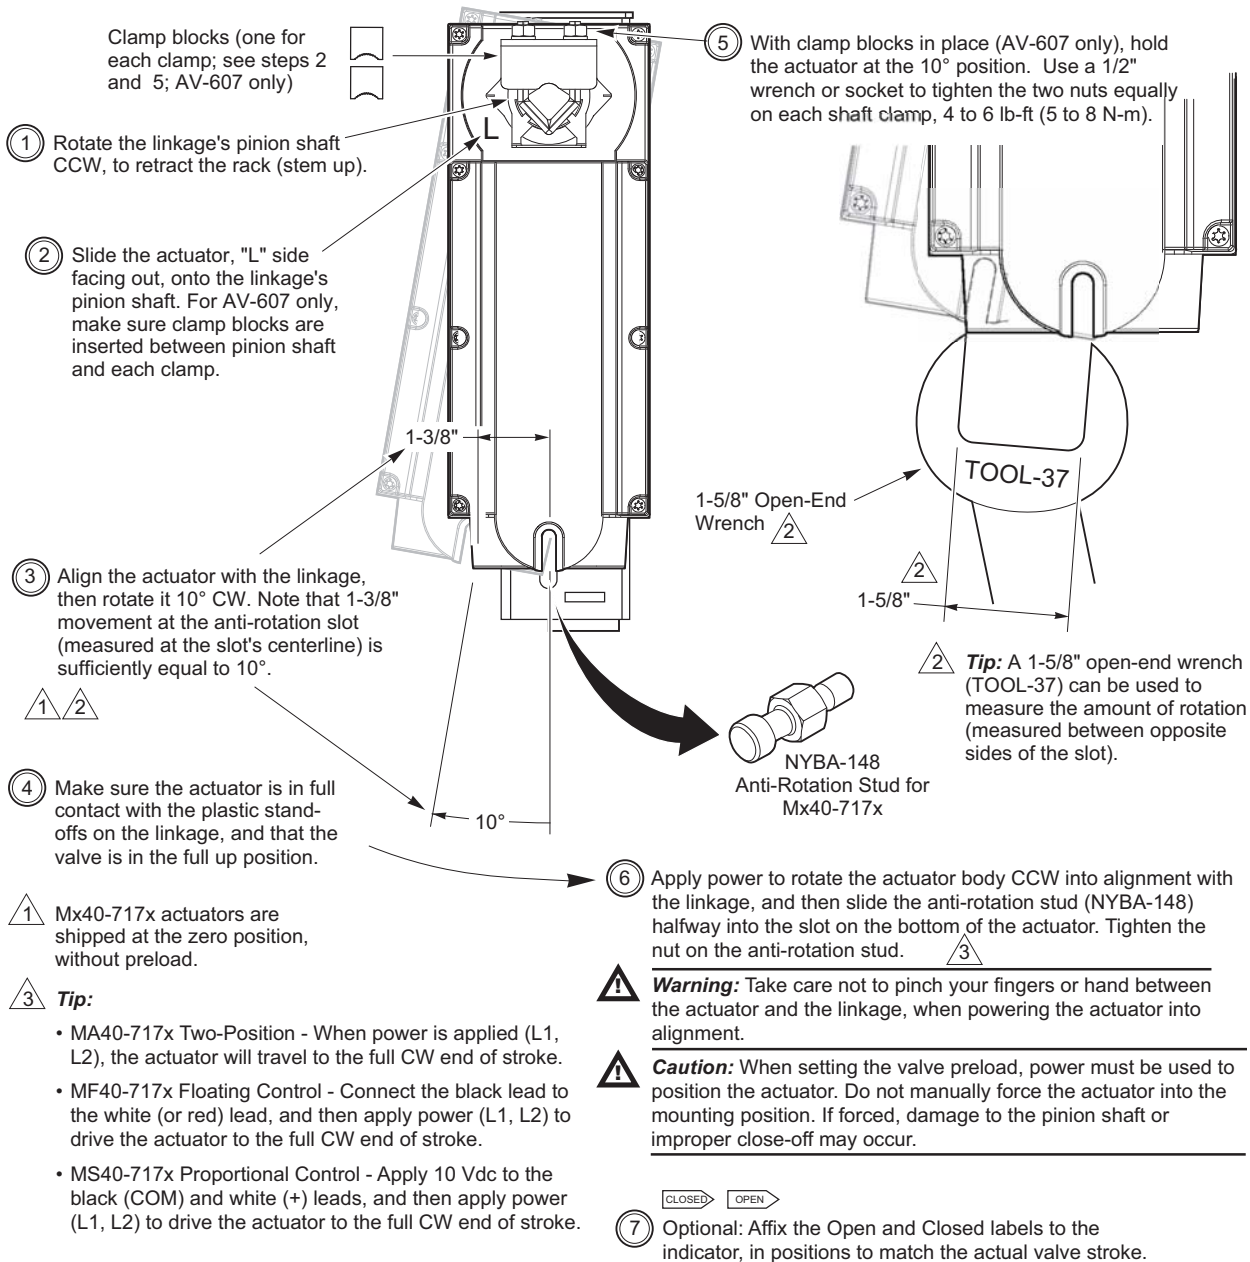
Mounting Mx40-717x and Setting up Actuator/Linkage/Valve Assembly.
